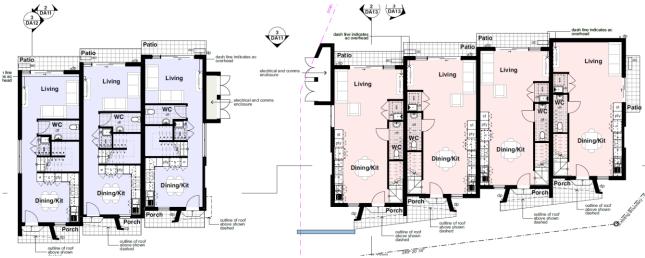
Extract of ground floor layouts (Source: Stanton Dahl Architects).
